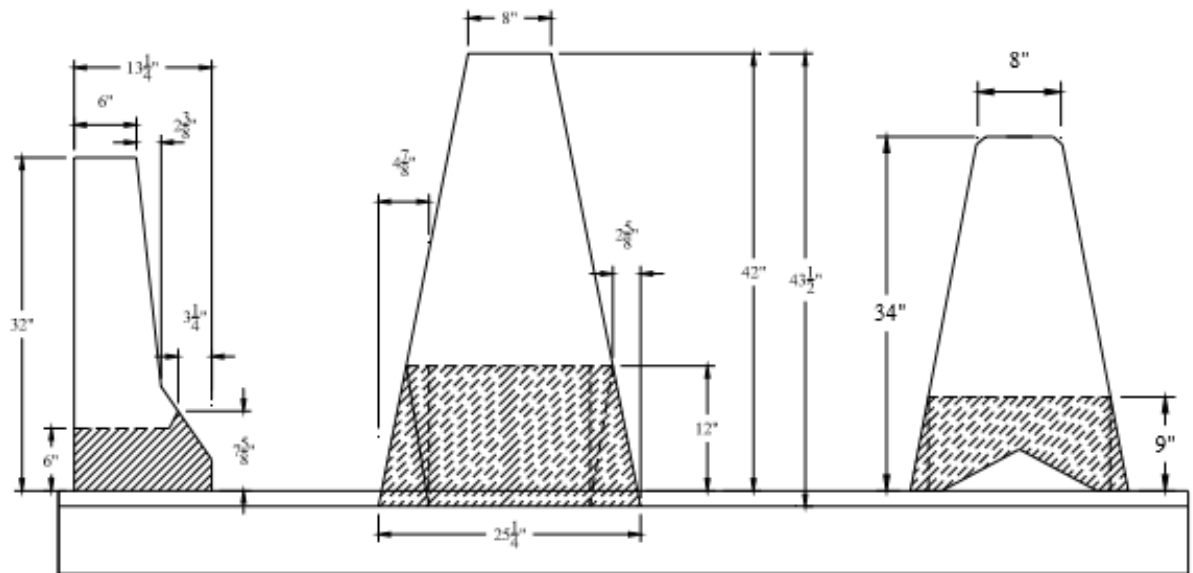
Side-View Comparison of LaDOTD F-Shape Barrier, TxDOT Wildlife Crossing Single-Slope Concrete Barrier (SSCB), and WSDOT Pin-and-Loop Barrier.
